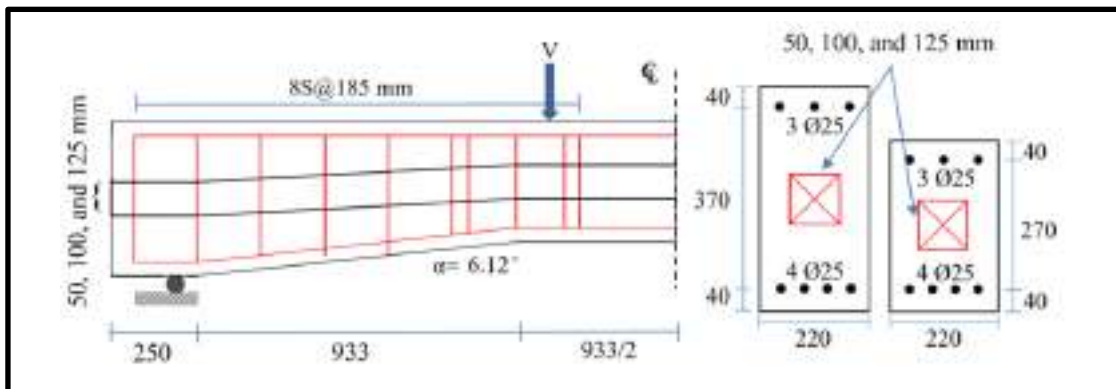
Details of three RCHBs have longitudinal opening with different sizes.
